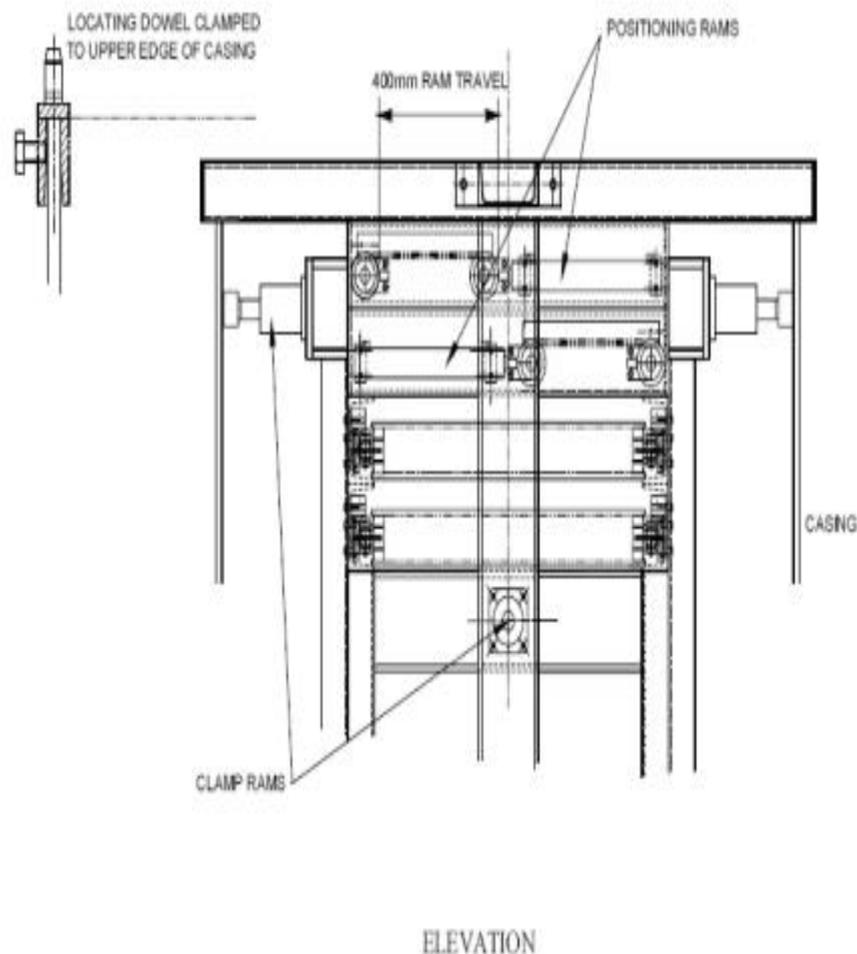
Elevation profile of CEMlock beam used for Plunge Column installation
